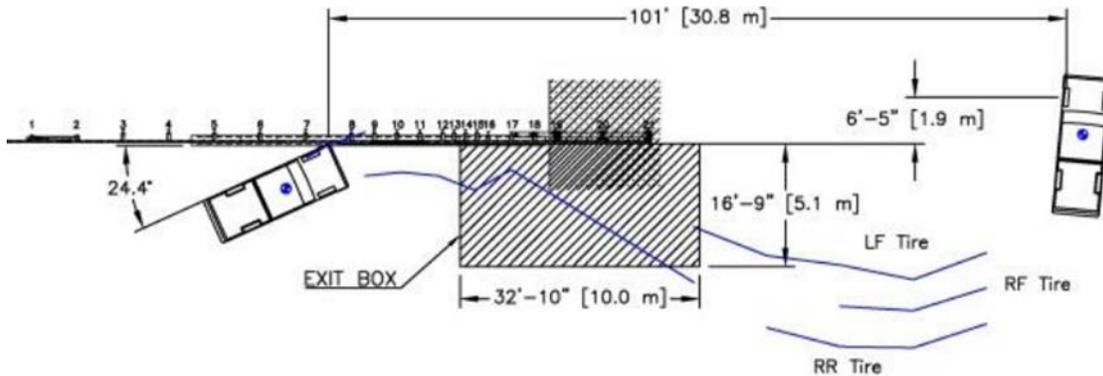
Test Impact Drawings for Test No. MWTC-3.
